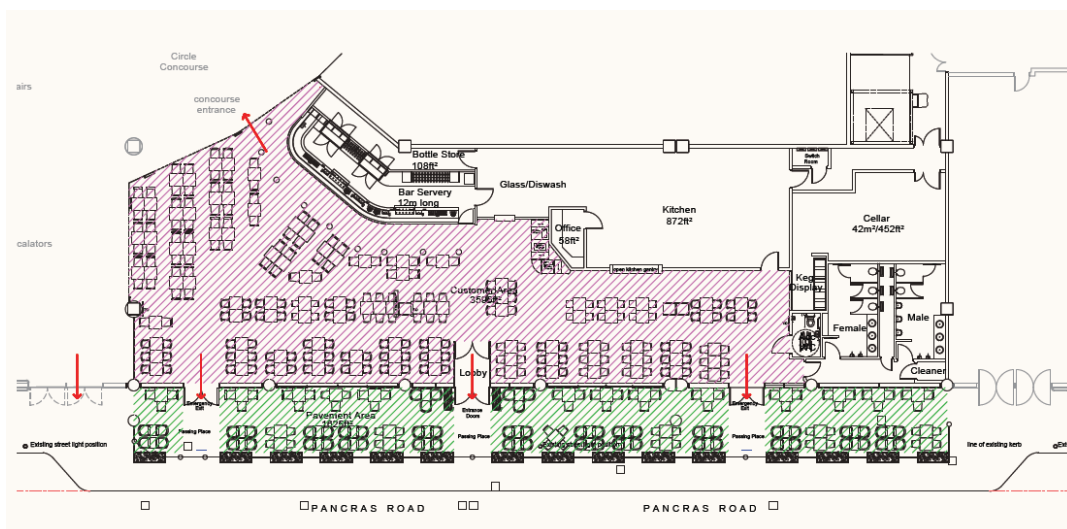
Proposed reconfiguration of the pavement / loading bay and extension of the external seating.
